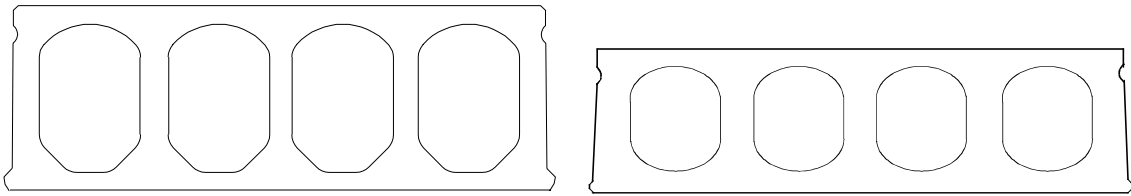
Typical slab cross-sections with non-circular voids used in Finland.
